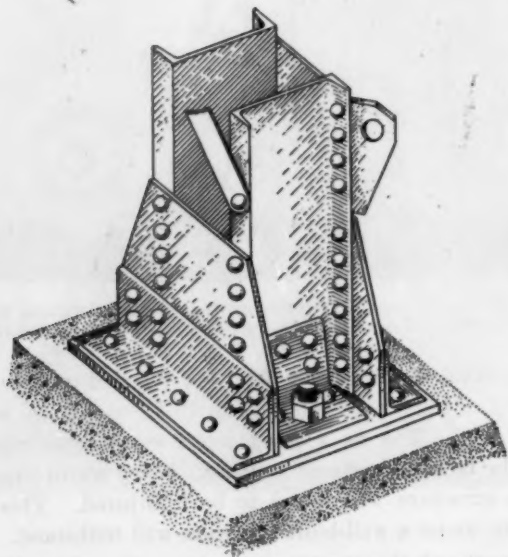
TYPICAL CONSTRUCTION OF FOOTING FOR CHANNEL COLUMN
